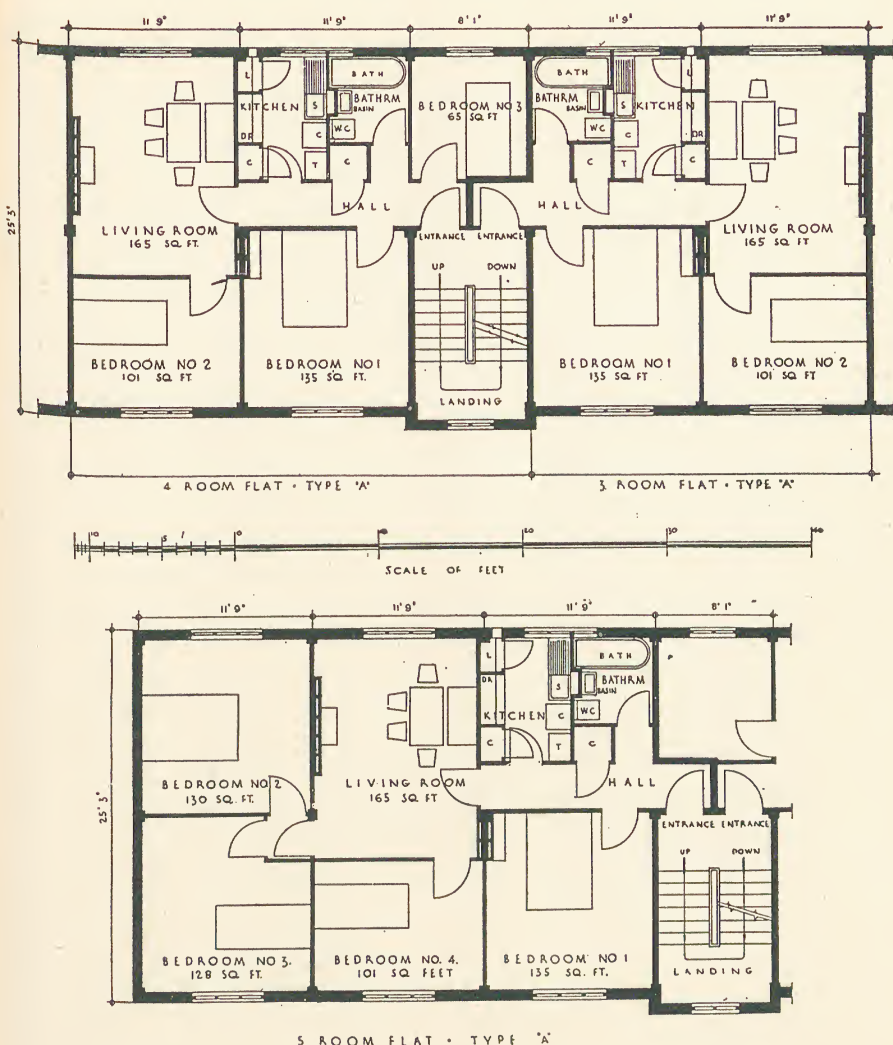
ARRANGEMENT OF INDIVIDUAL FLATS COMPRISING THREE, FOUR, AND FIVE ROOMS. INTERNAL STAIRCASE APPROACH
